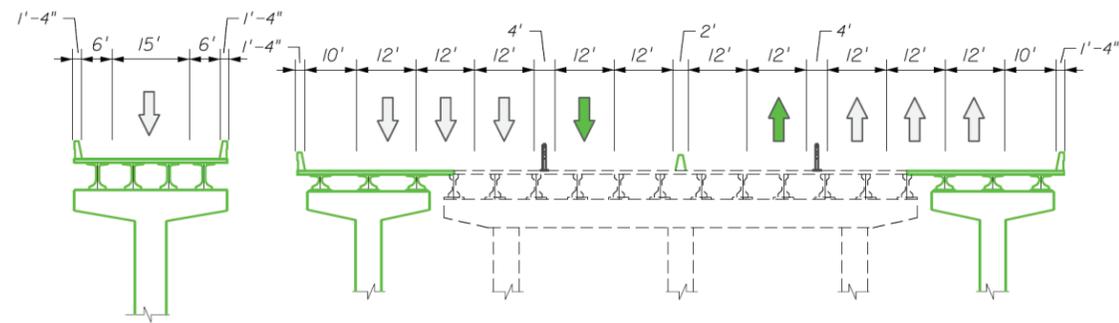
Proposed Bridge Over SW 88th Street/Kendall Drive Typical Section
